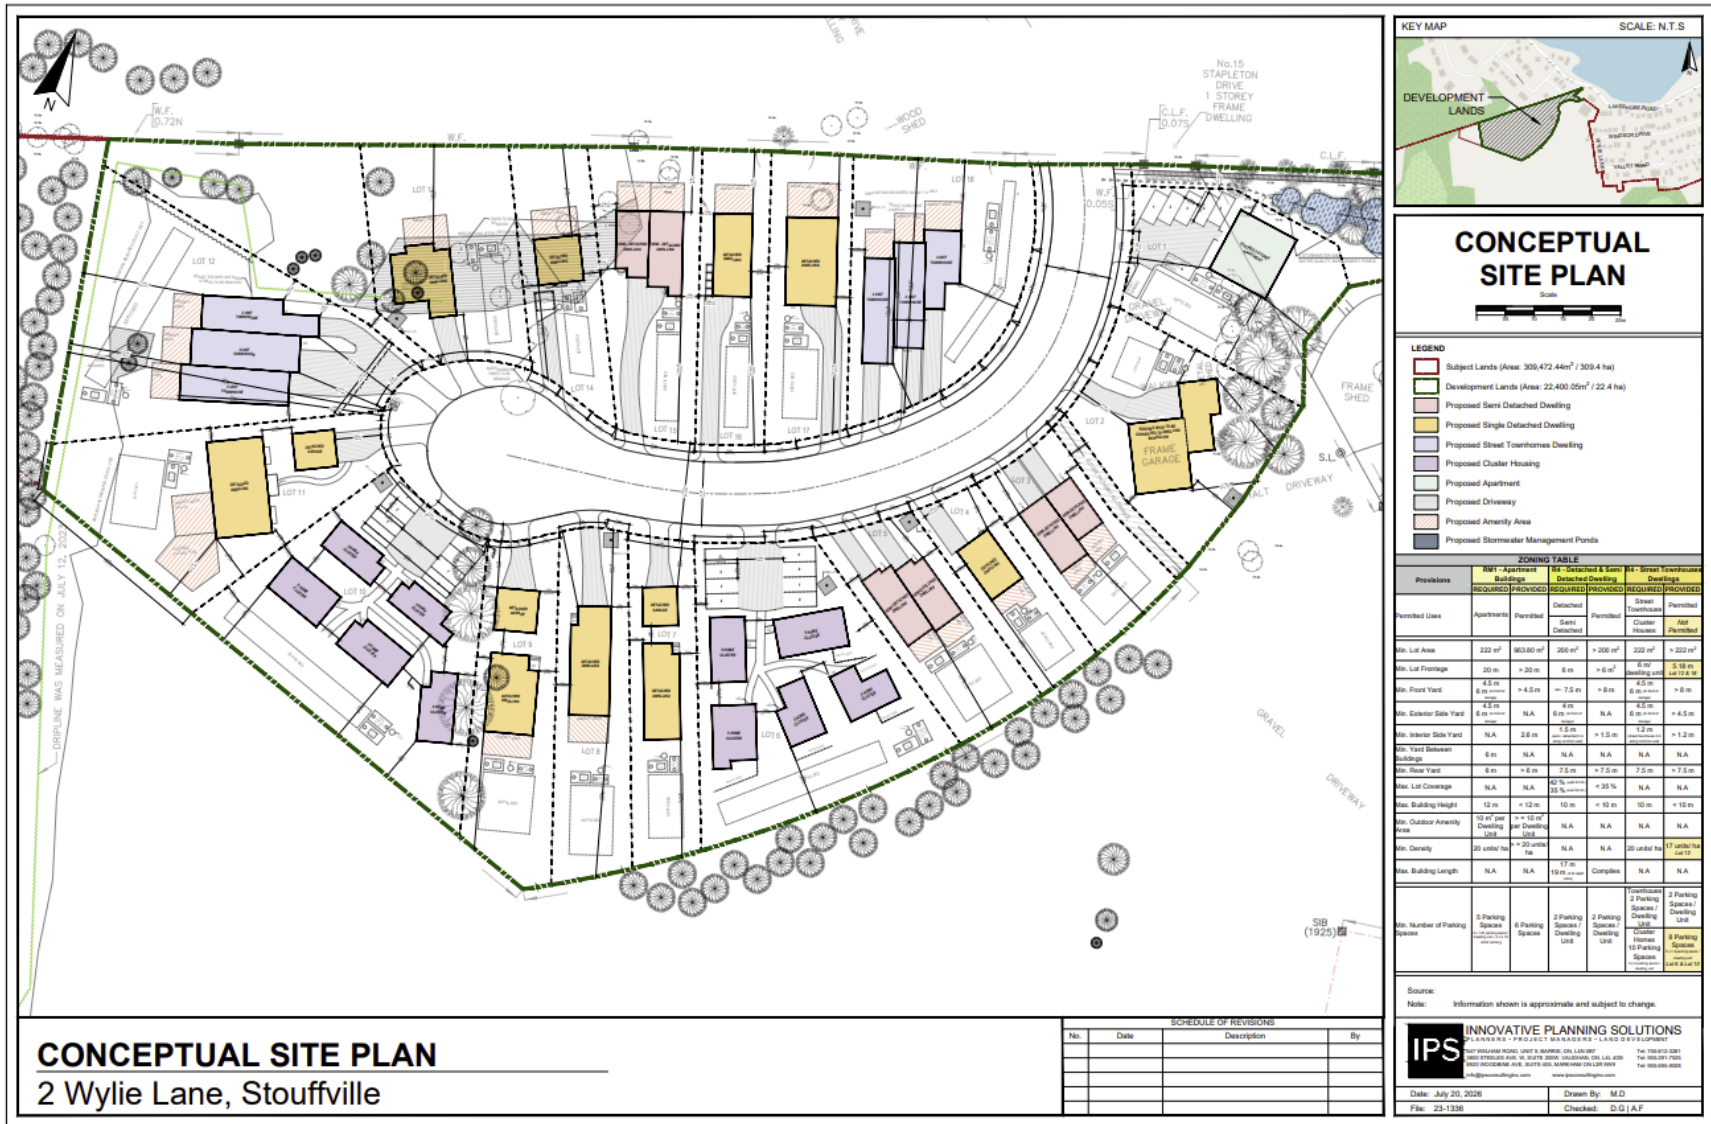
Site Plan prepared by Innovative Planning Solutions, dated July 20, 2026.
